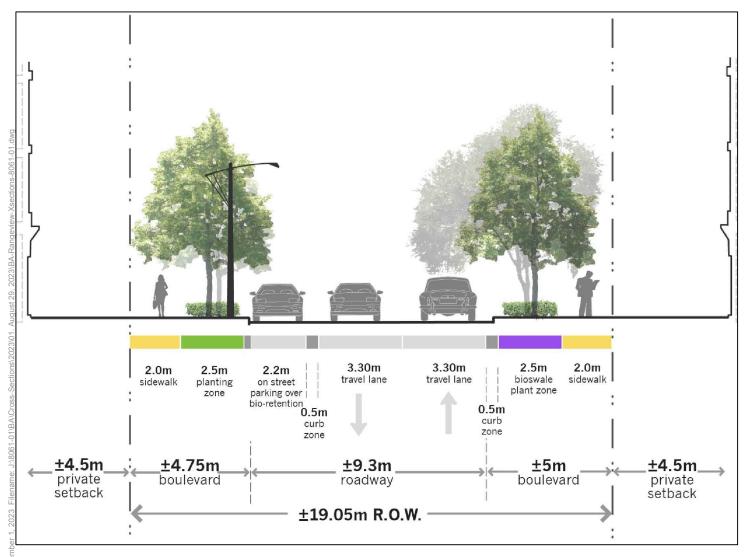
RANGEVIEW ROAD - FUNCTIONAL PLAN & CROSS-SECTIONS
